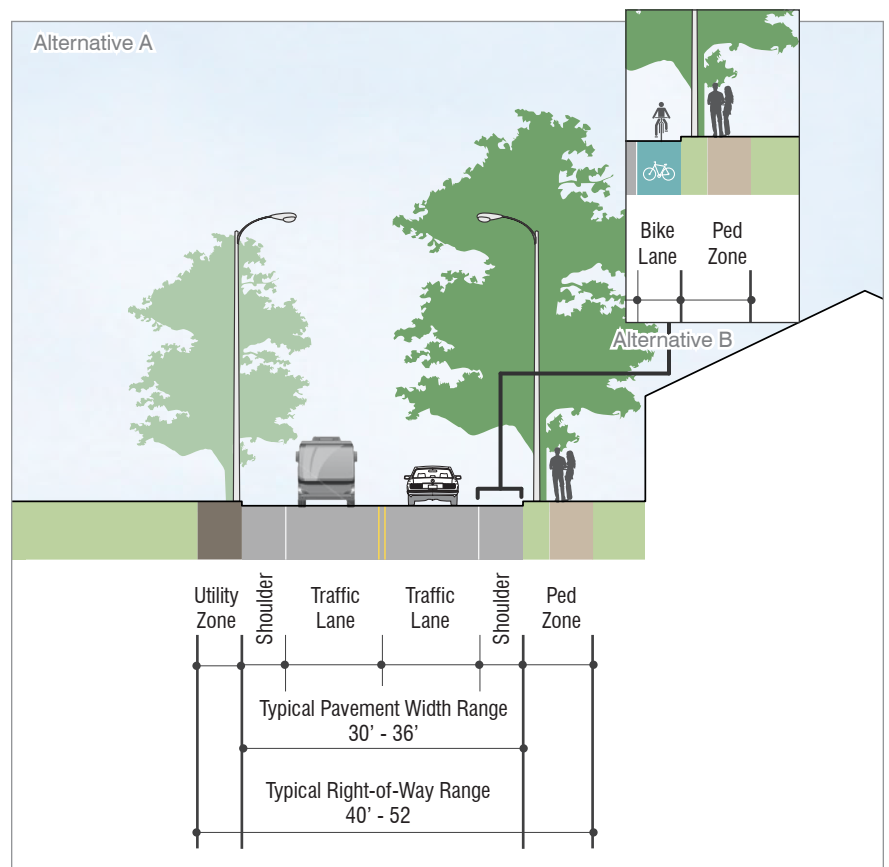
Typical Existing Street Section for 'Rural Township Connector' Typology
